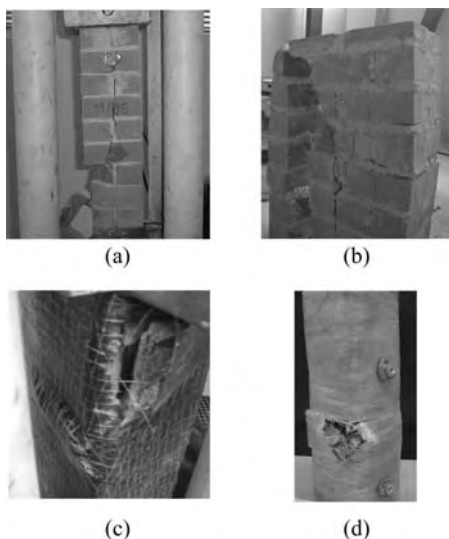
Failure modes of unconfined and FRP-confined masonry: (a) vertical cracking in specimens with square cross section; (b) vertical cracking in specimens with cross section aspect ratio 2:1; (c) fracture of CFRP at corner; (d) fracture of GFRP at corner.
